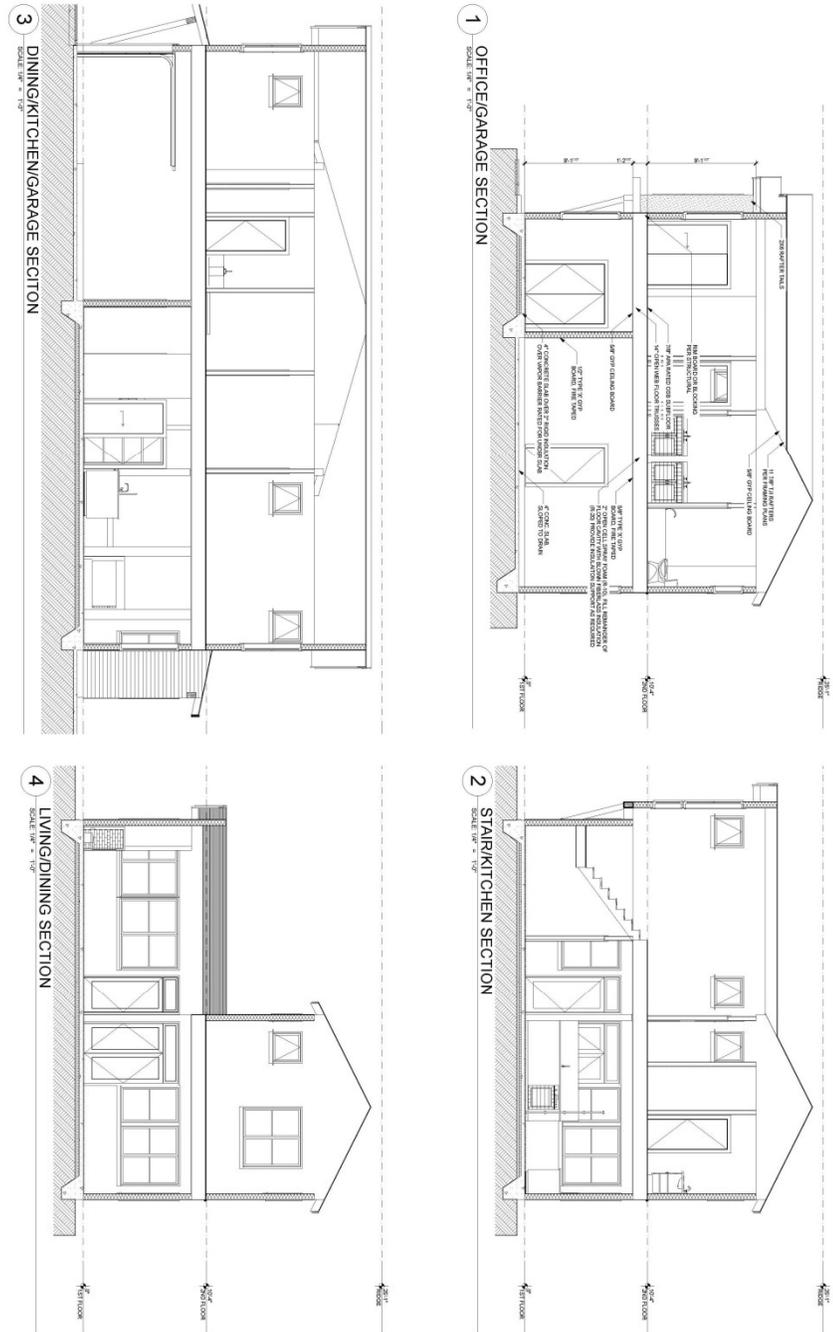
Building Sections (as approved by the Planning and Design Commission)
